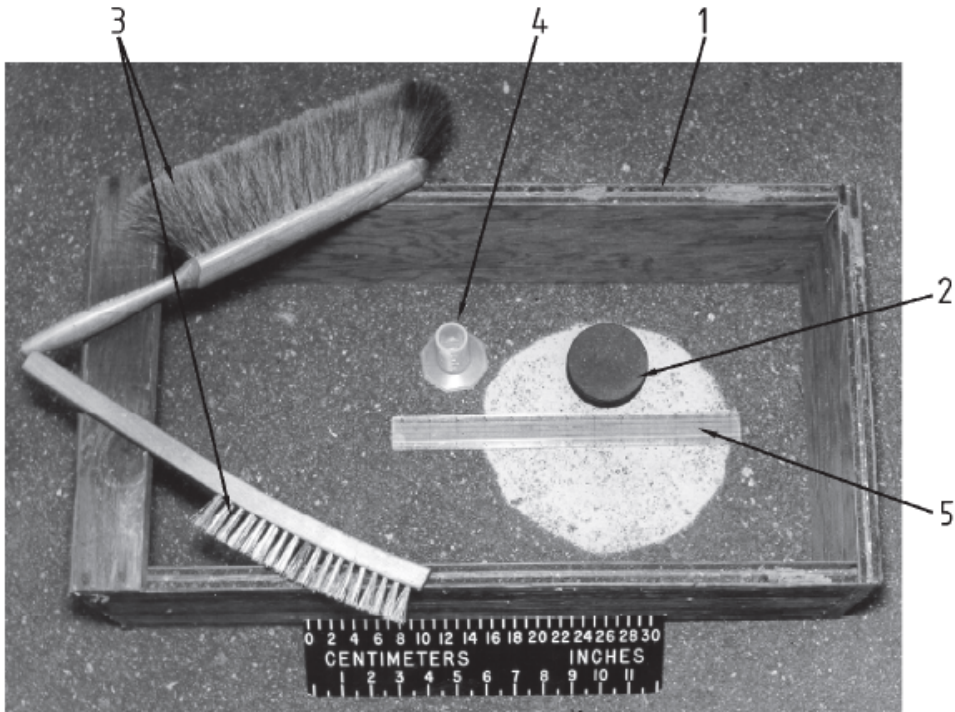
Apparatus for measuring surface macrotexture depth
